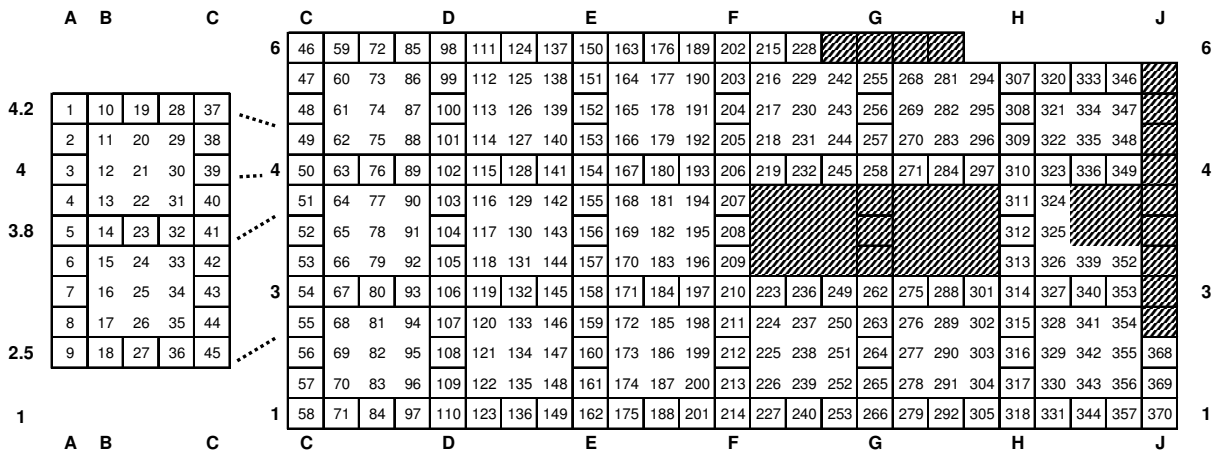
VTK2 Test Grid Point Numbers (Tested Floor #3)
